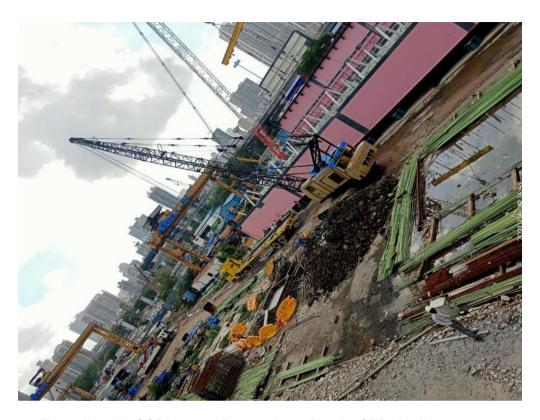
OSD Assembling works at Bay-05 STP Yard in progress
